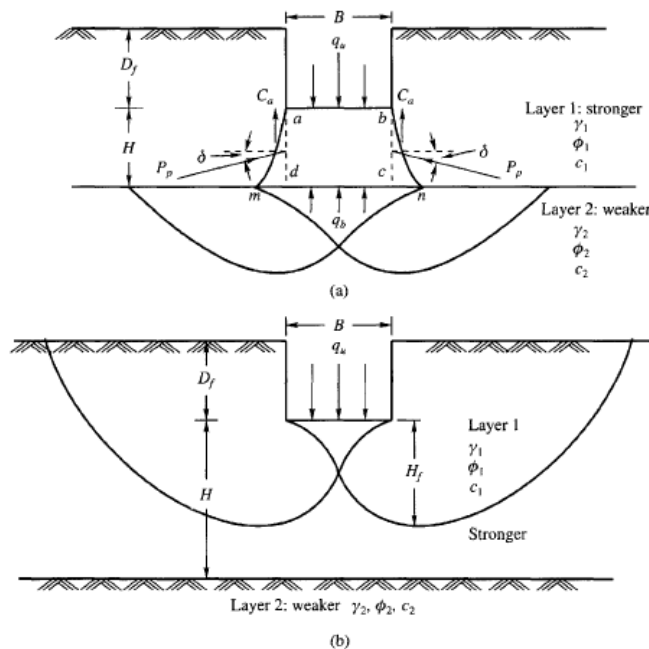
Failure of soil below strip footing under vertical load on strong layer overlying weak deposit (after Meyerhof and Hanna, 1978)
